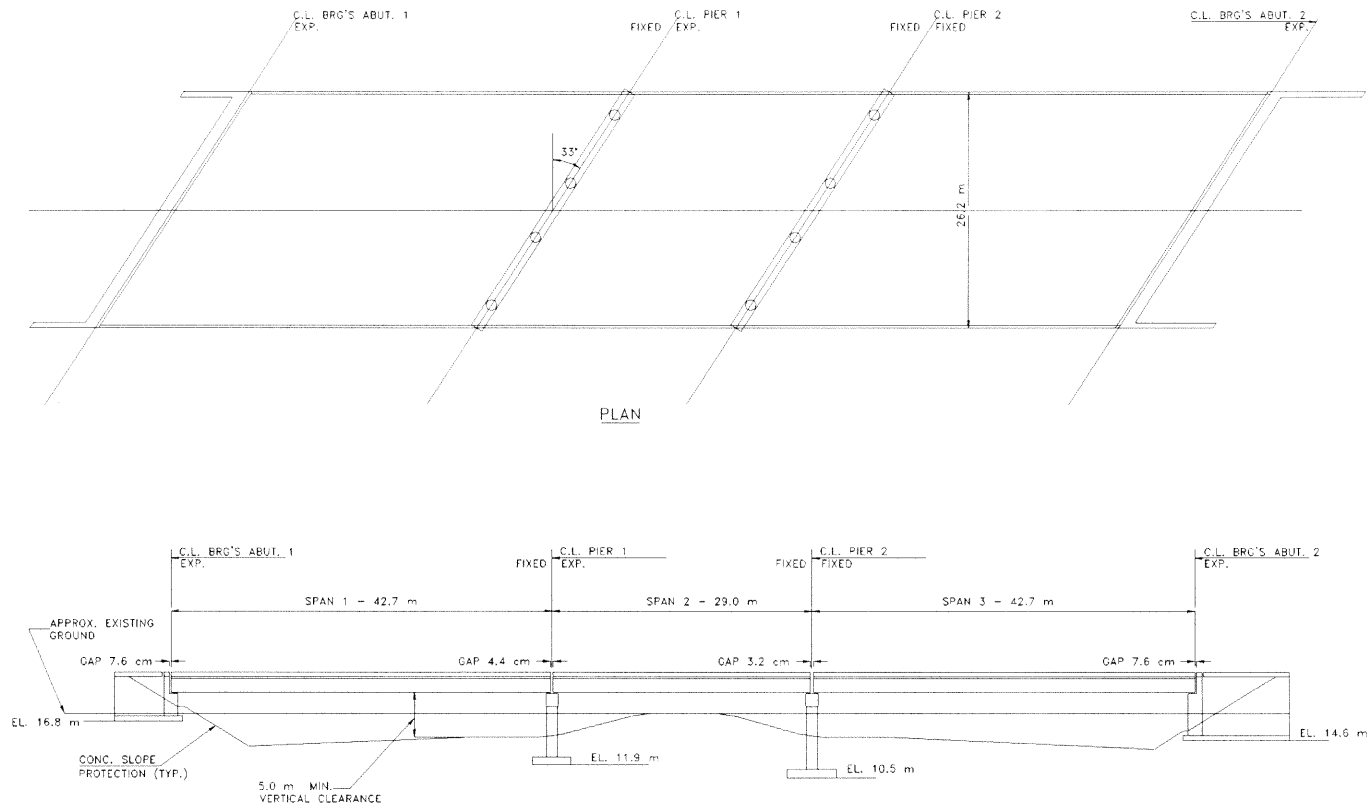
Plan and Longitudinal Elevation of a Typical MSSS Bridge (Bridge #1)
